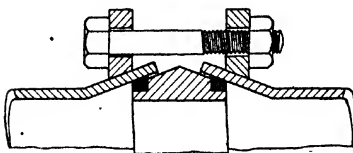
WILLIAMS' LOOSE-FLANGE JOINTS
